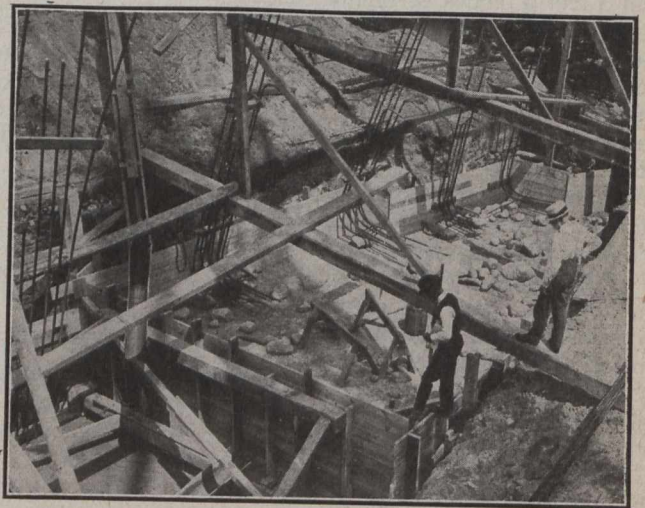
Footing of West Wing of North Abutment; Reinforcement Rods for Counterforts
